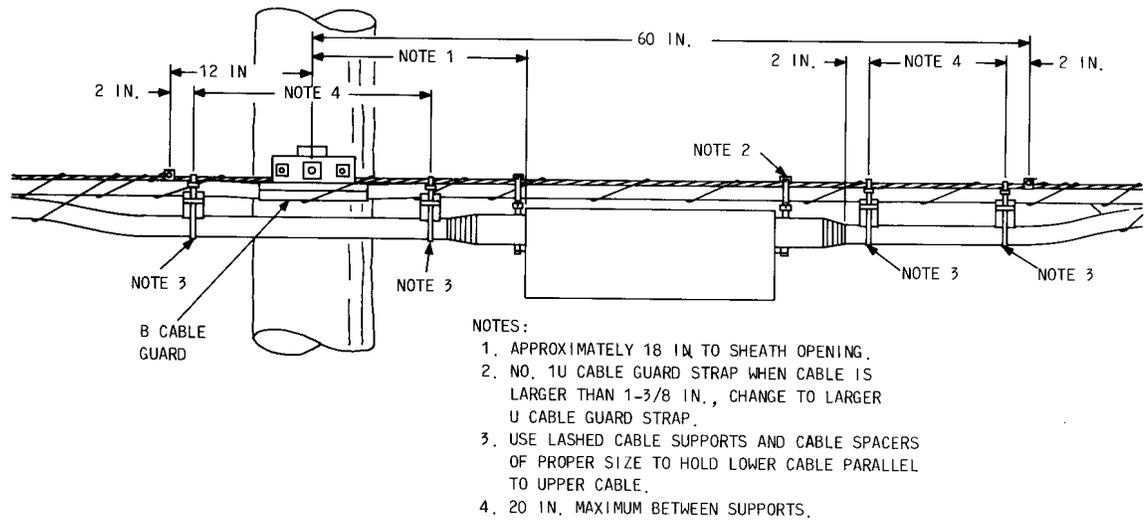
105-Type Cable Terminal—Two Cables Lashed to a Single Strand
